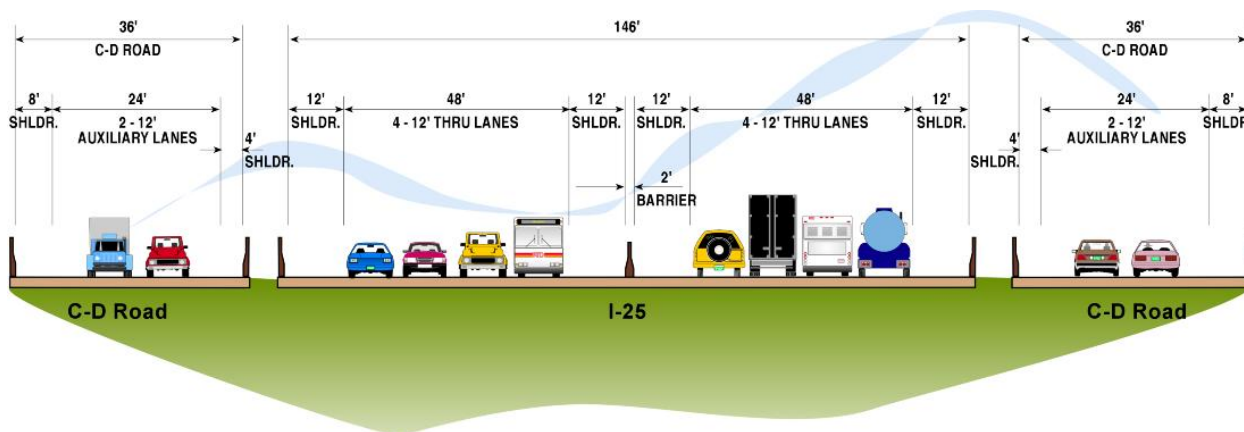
System Alternative 2, I-25 Typical Section, Broadway to Santa Fe Drive
